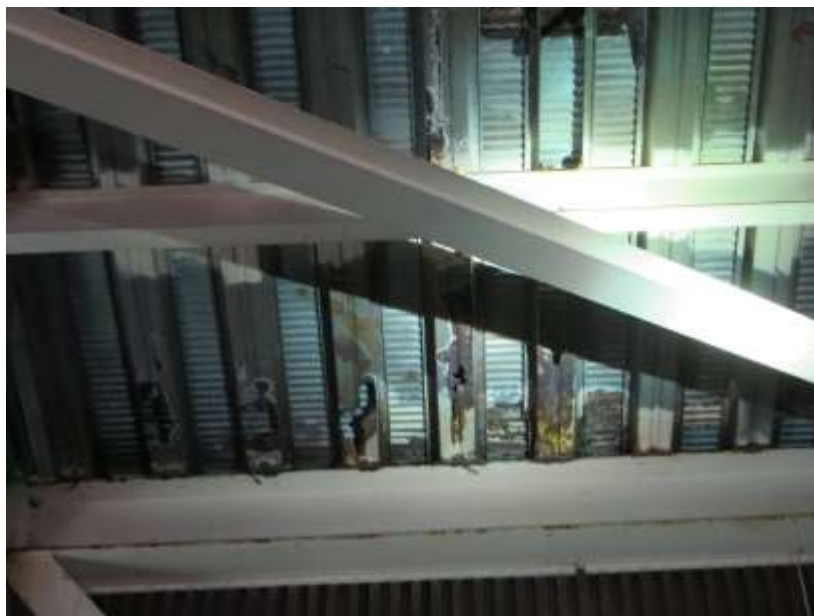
Example of lightweight floor slab decking classified as Condition State 3.
